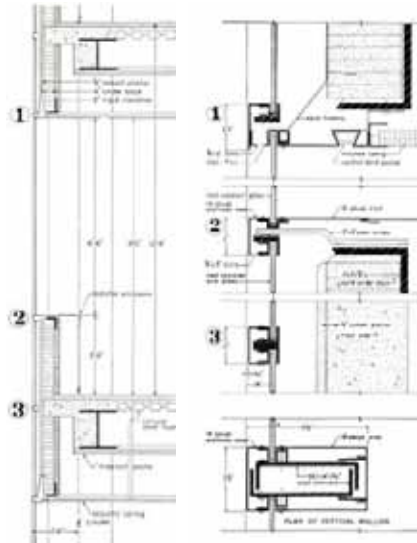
Lever House wall section and details. Source: Architectural Forum, June 1952
